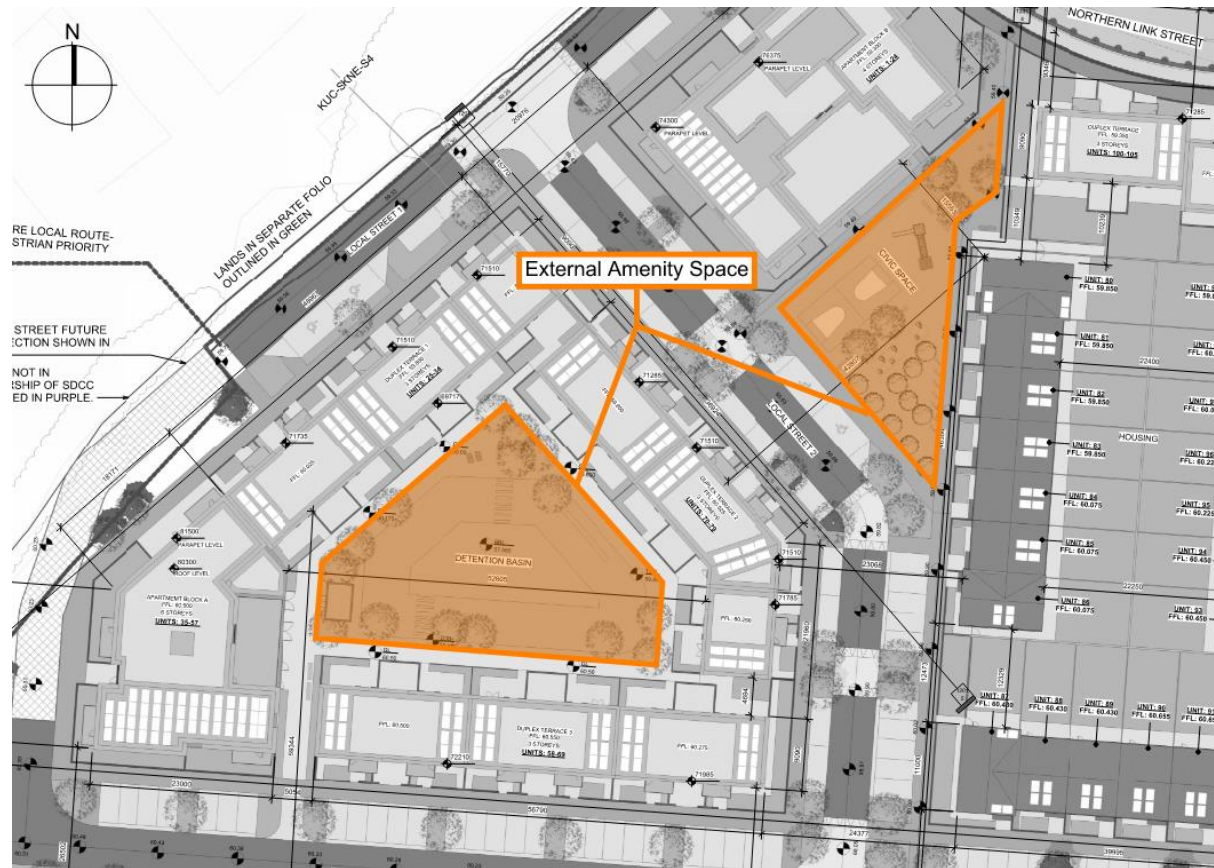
Roof plan showing the location of the external amenity spaces (Reference: SHB5-CSD-DR-MCORM-AR-P3-1002-PROPOSED SITE PLAN-)
